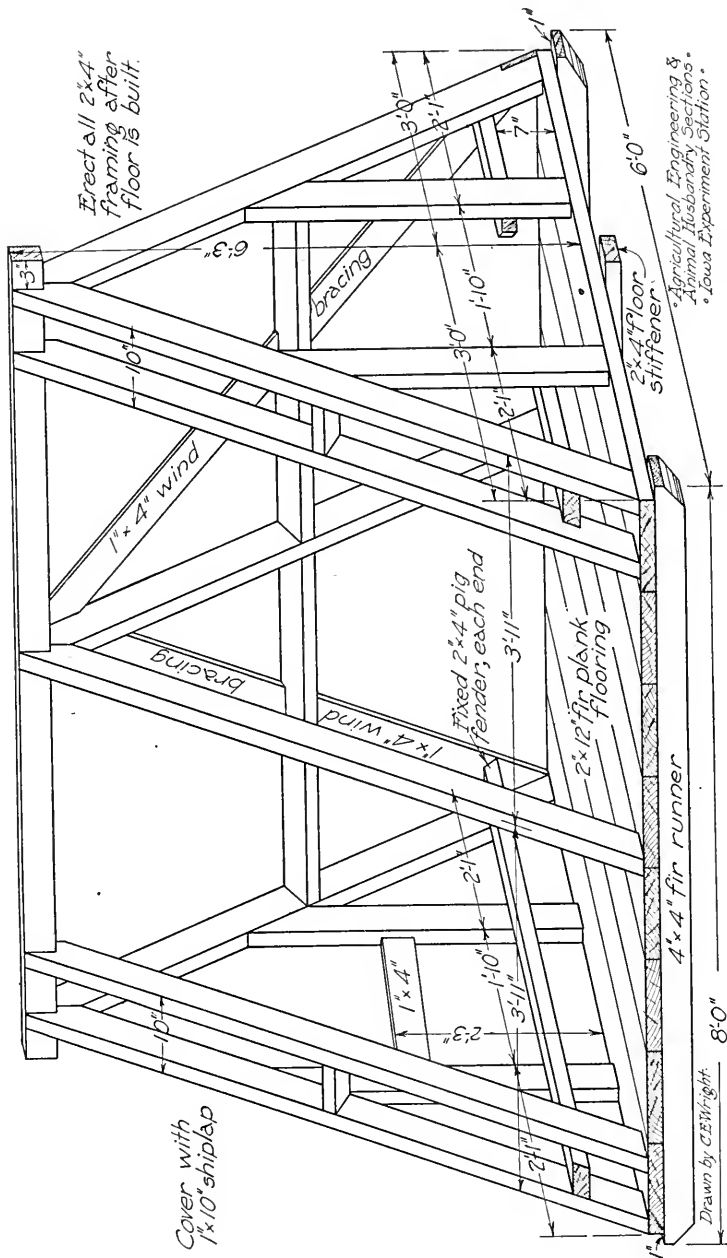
"A" House (Doors Hinged at Side). Perspective showing framing details.
